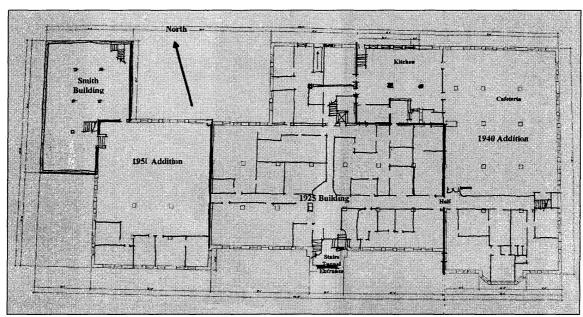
Basement floor plan (M+ Architects, Sioux City)
